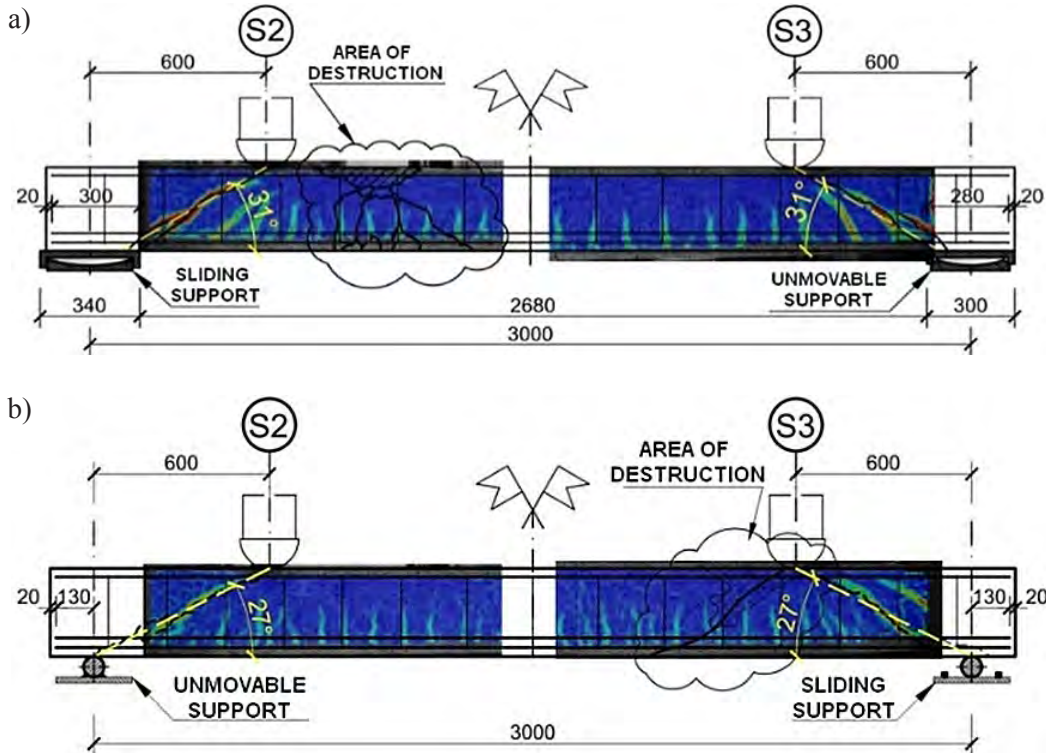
Example beam cracks images from the optical measuring system Aramis: a) beam S2M-1 – wide support, b) beam S2M-3 – point support
